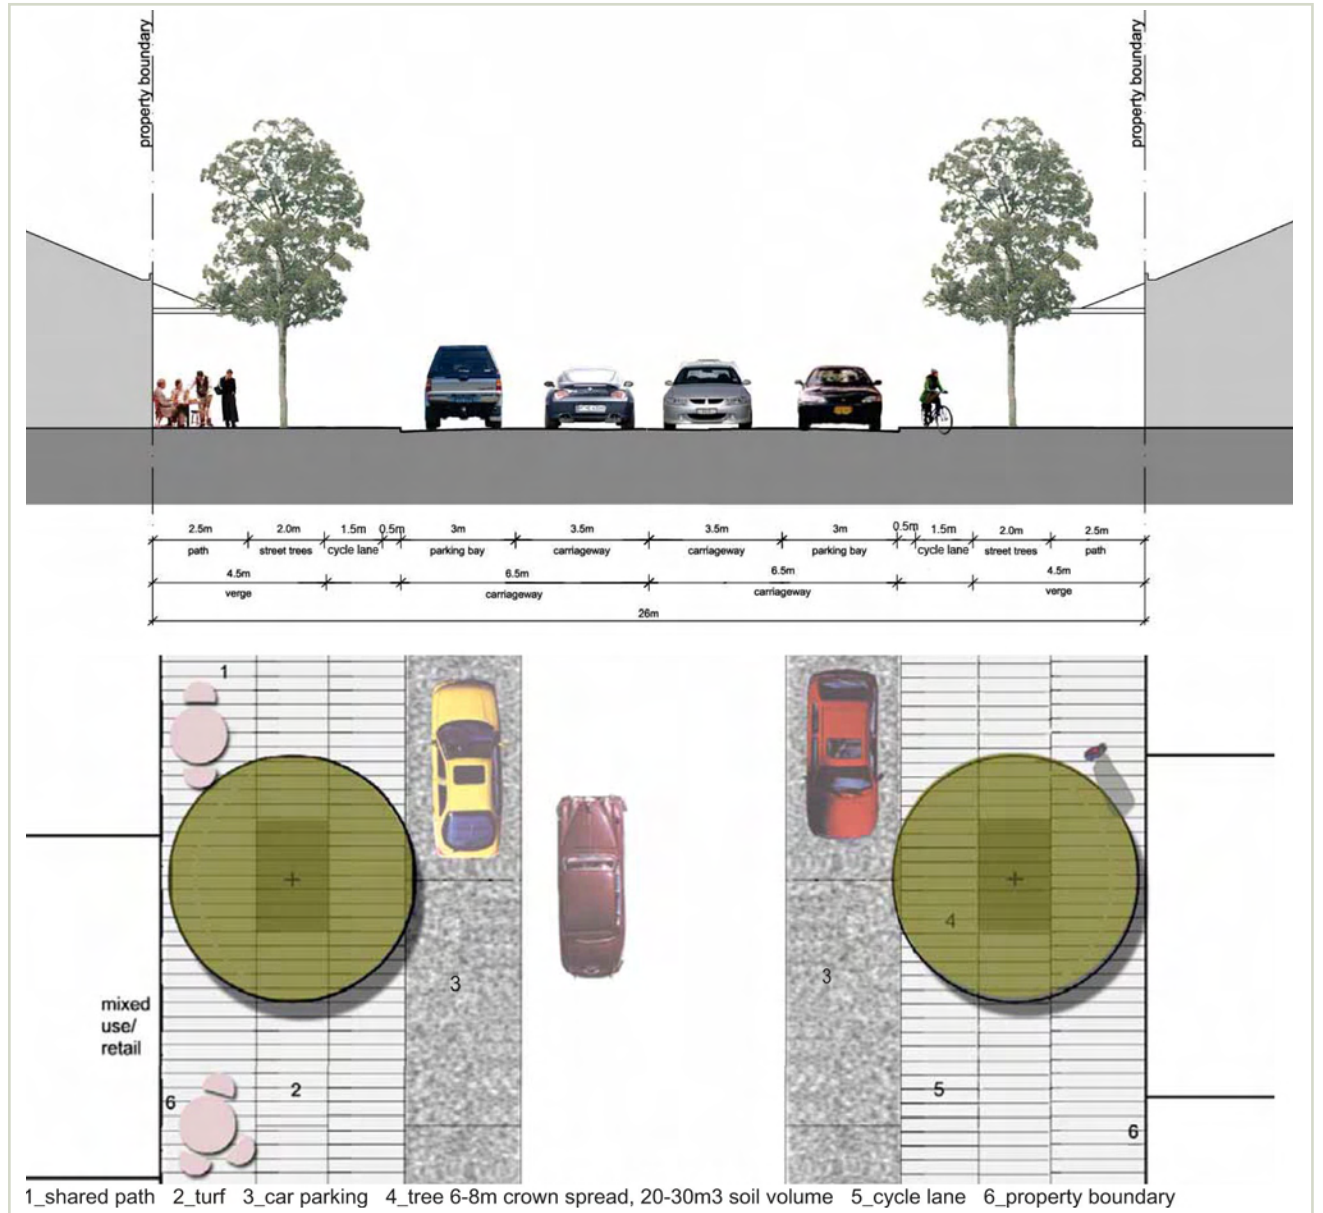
Minmi Boulevard Within Proposed Village - 26m (Section 2-2)
